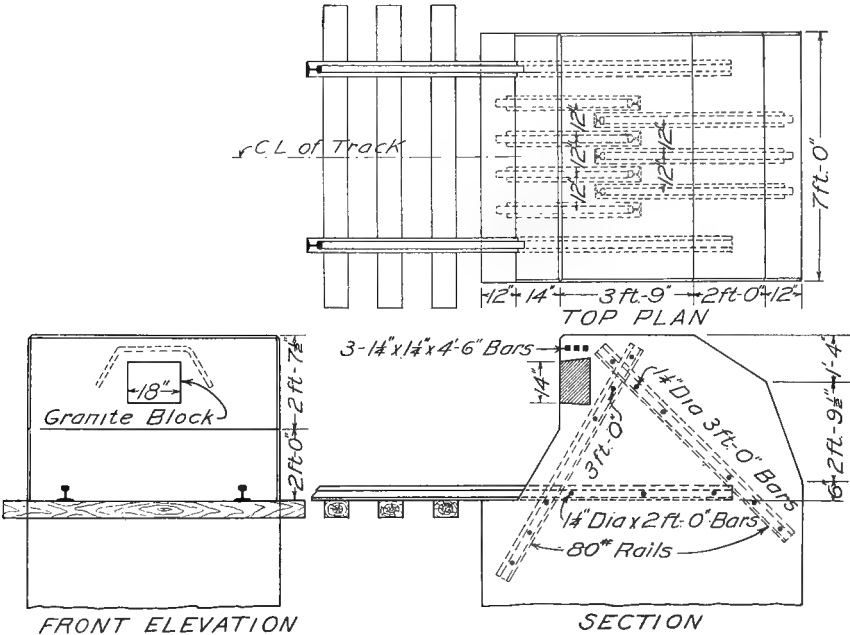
STANDARD CONCRETE BUMPING POSTS, D., L. & W. P. R.
